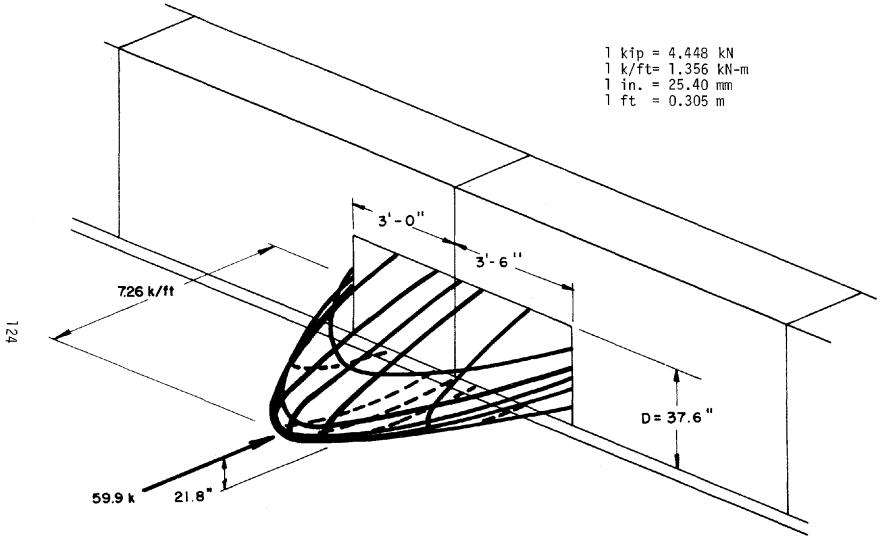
Sketch Showing Rectangular Contact Area on Instrumented Wall.
